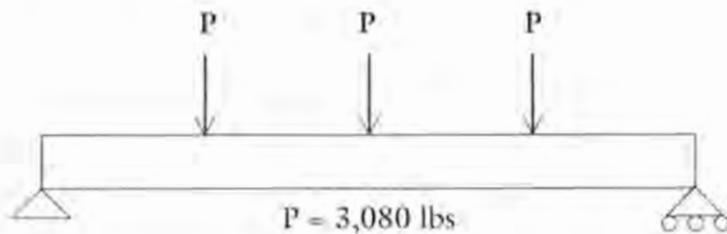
SCHEMATIC LOADING DIAGRAM OF SUMMER BEAM SHOWING POINT LOADS FROM JOISTS.
